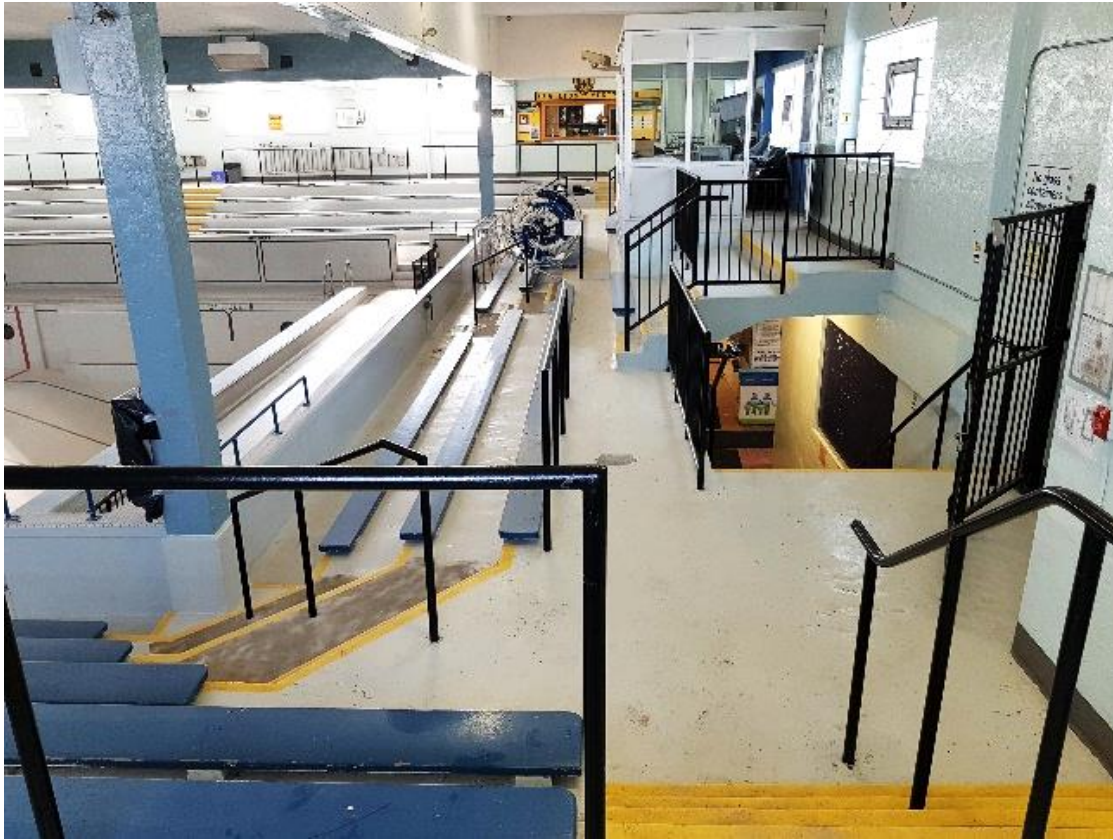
South side of the pool, looking east. The judge's booth, gallery, south bleachers, and stairs to the lobby floor are visible.
